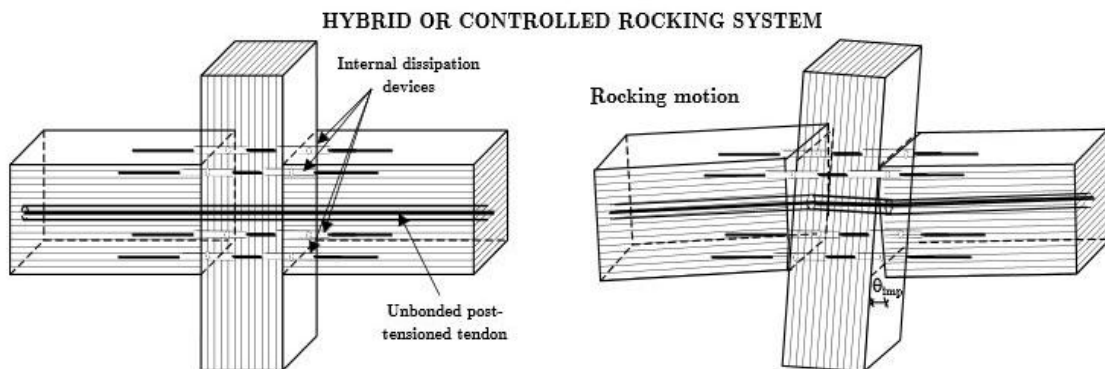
Post-tensioned beam-column connection made of precast concrete elements [20]
